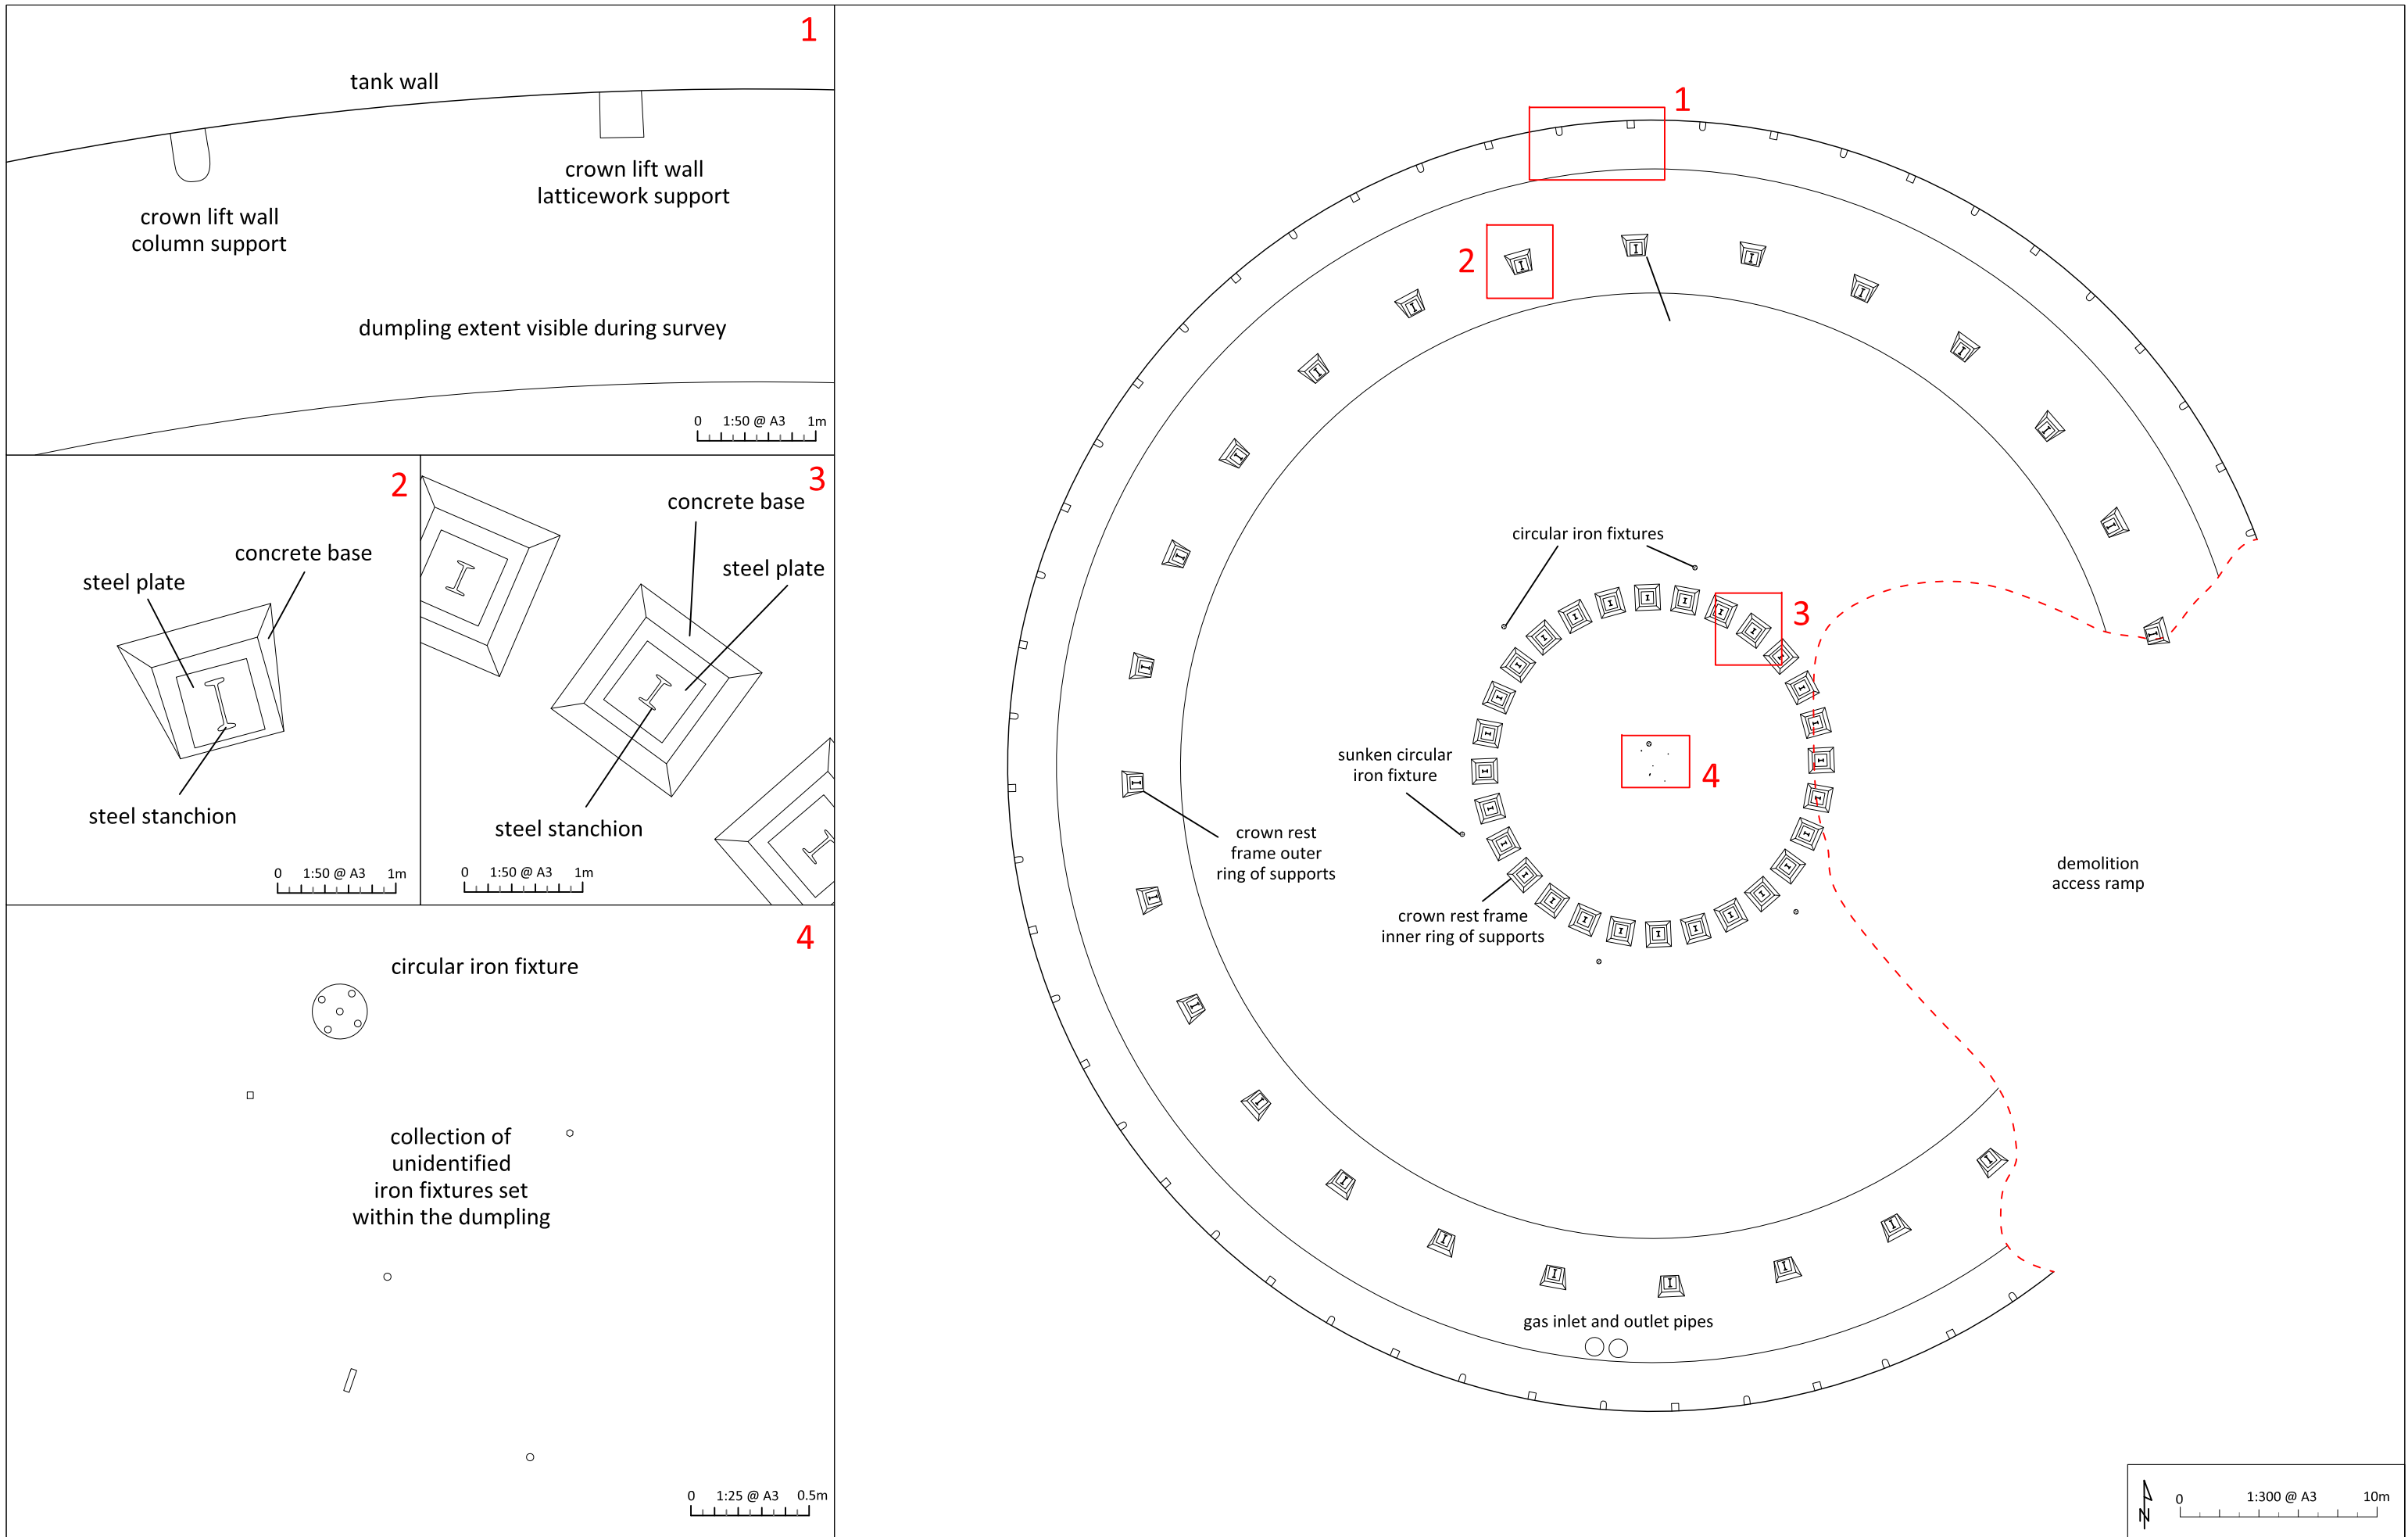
Gasholder No 5, detailed below ground tank dumping plan
